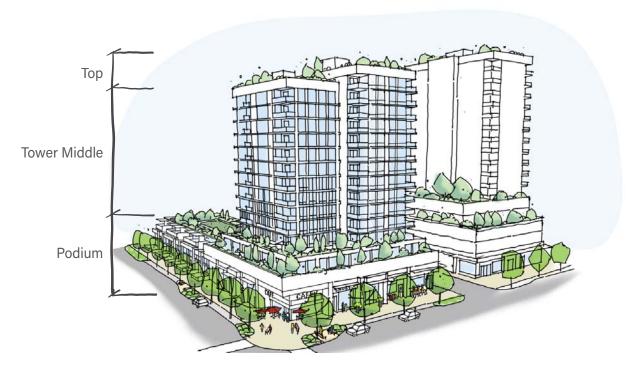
Design tall building to have a distinct podium, tower, and top (7.1.6. a).
